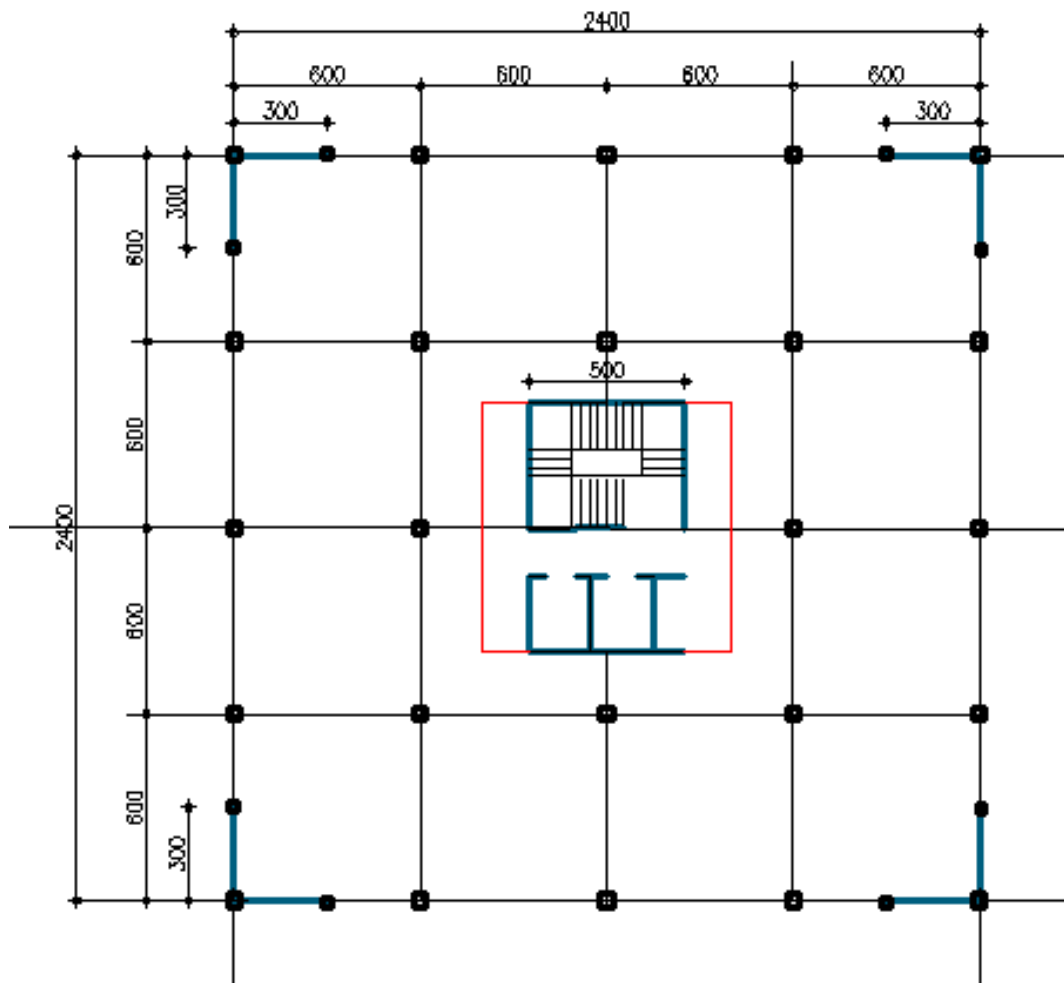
Building frame with section 24x24 m with columns axes every 6 m with concrete core wall in the centre with dimensions 5x8 m and with perforated panels with dimension 3 m (source: the author)
